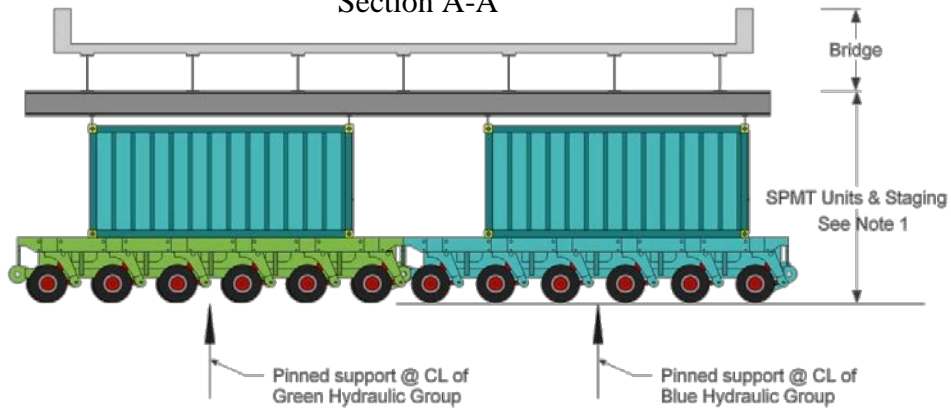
Example SPMT Layout for a Single Span Bridge.
